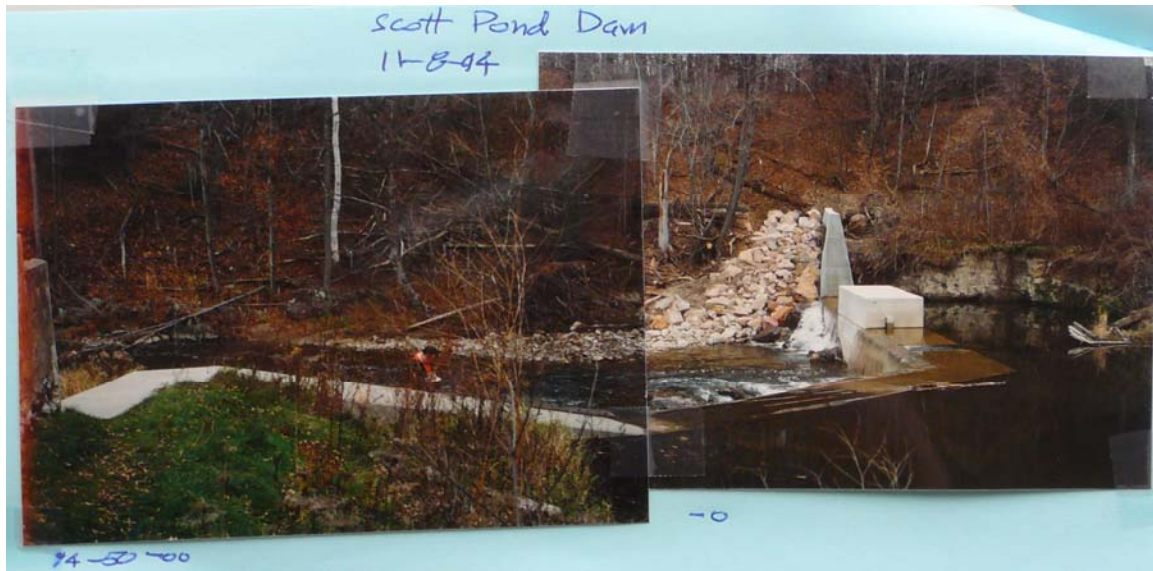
Scott Pond Dam in November 1994, after extension of right abutment, view downstream.
